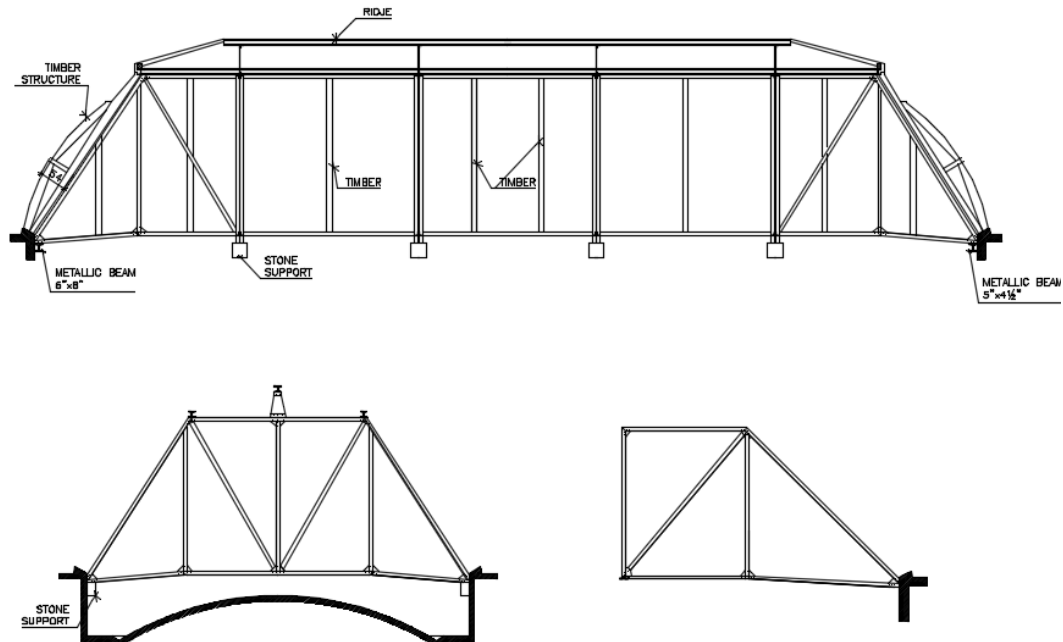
Structure of the roof over the barrel vault (Cerne Engenharia e Projetos, 2006c)
